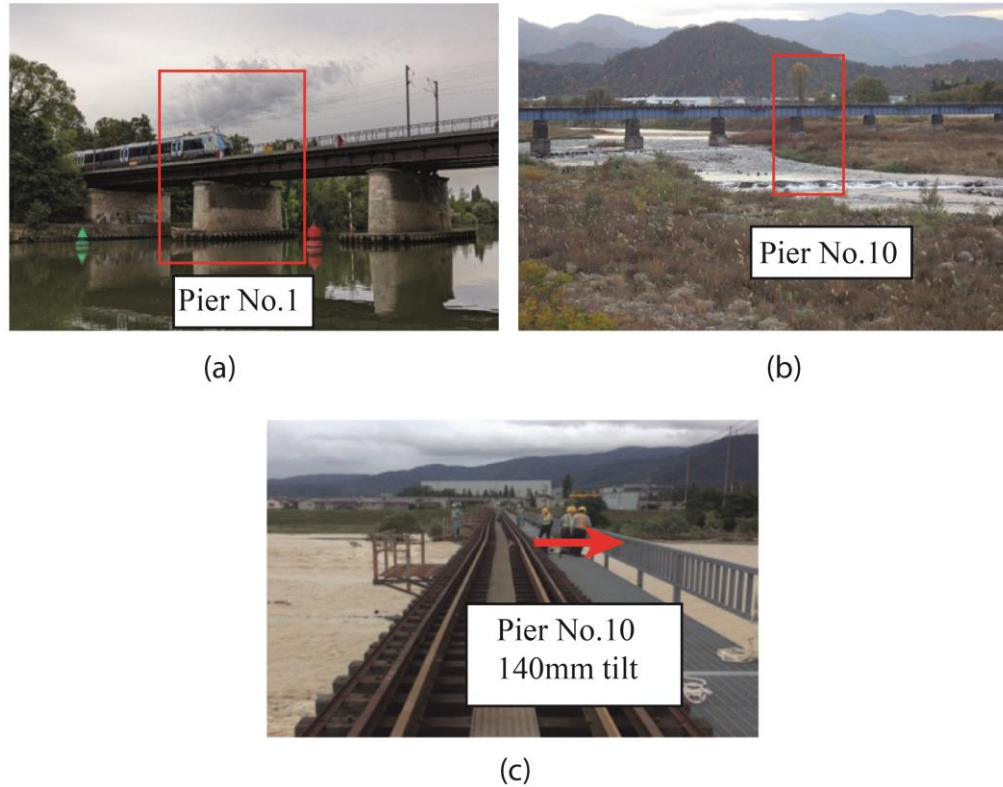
Photos of selected bridges for case studies: (a) Richebout bridge in France; (b) Ookawa bridge in Japan; (c) Tilting of pier No.10 (Ookawa bridge, Haiso et al., 2016)
